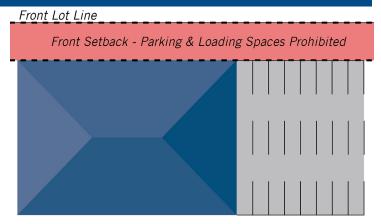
No Off-street parking space will be located within a Lot's Front setback area.
